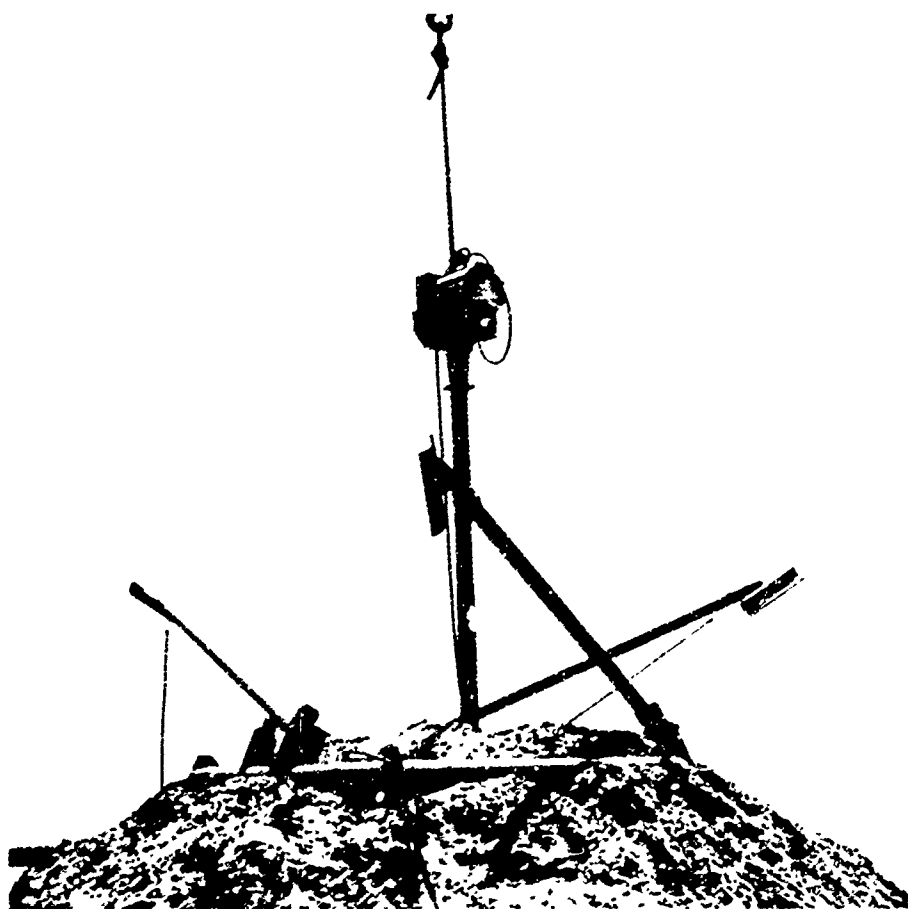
Support guidance frame; anchor embedded about 10 feet in sand on beach.
